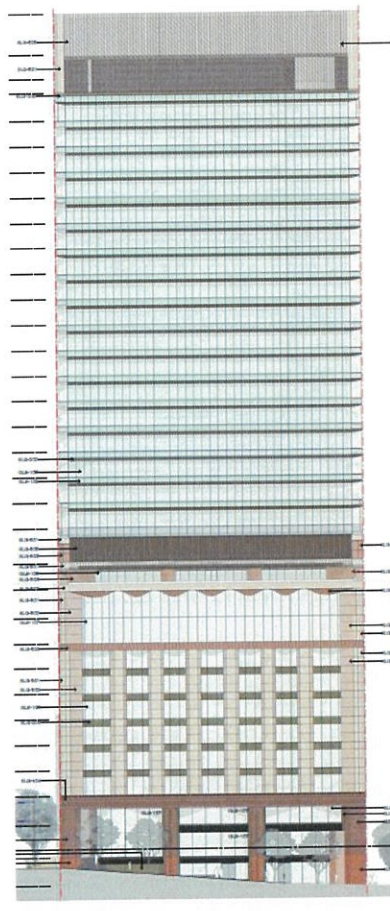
| North elevation (Martin Place) (Source: Applicant's RtS)
